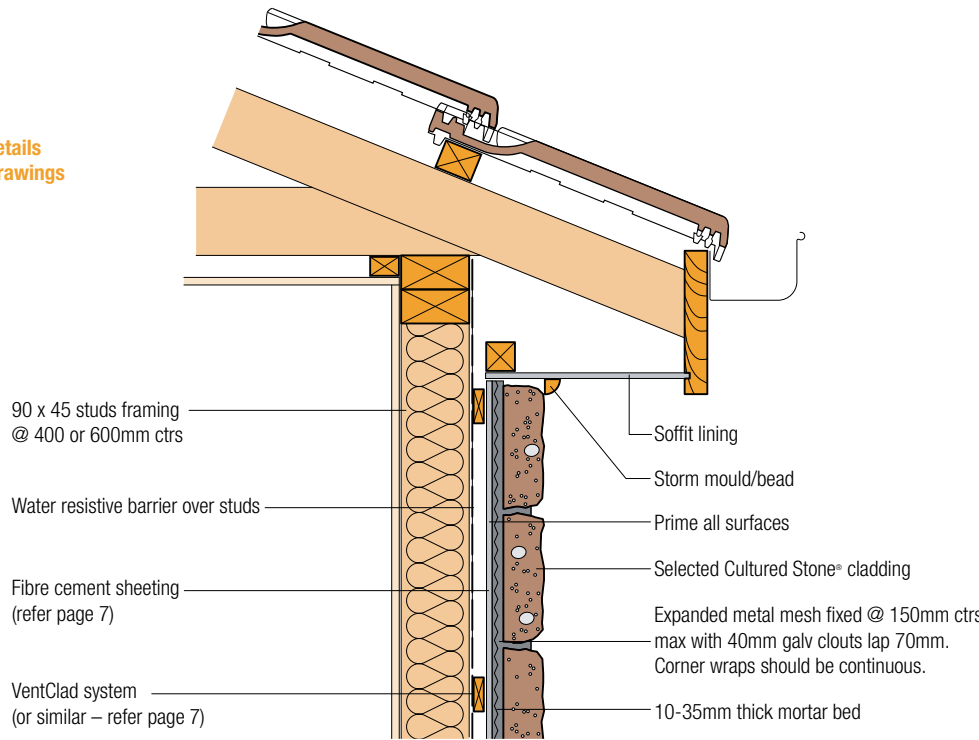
Typical Eave - Section (Dwg # CS-09.04)
